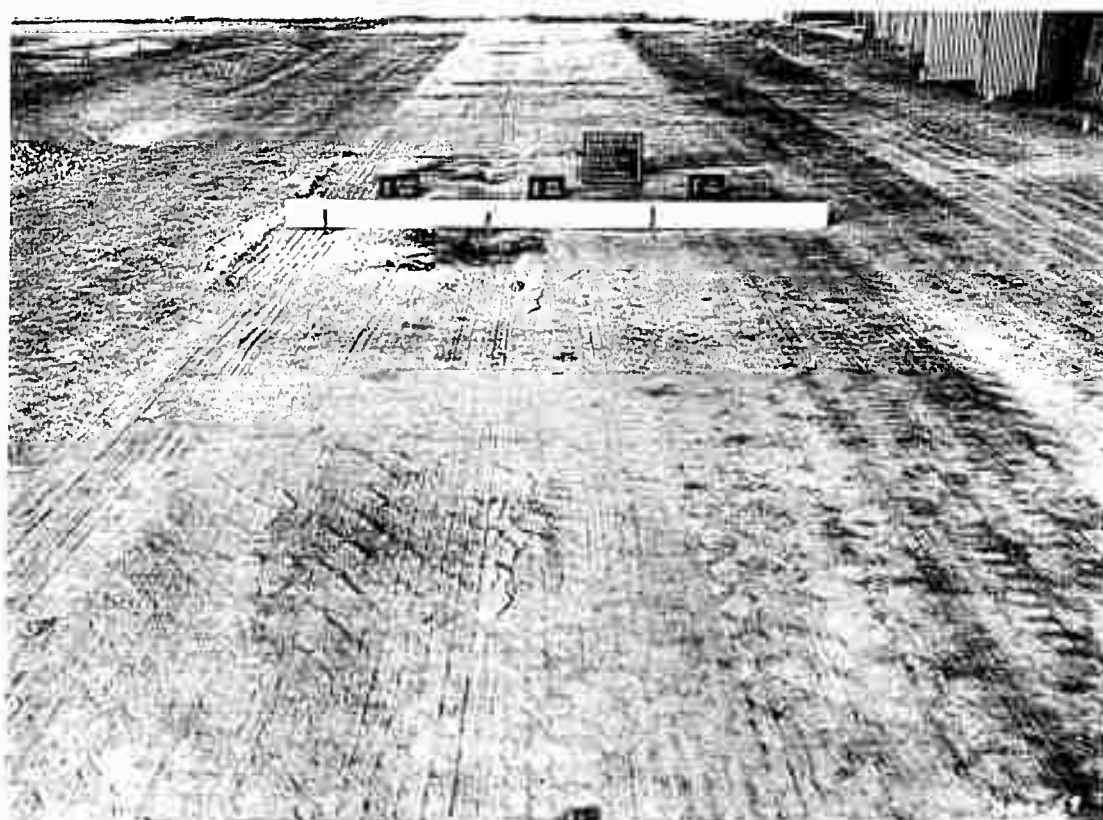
Progressive failure at sta 4+77, lanes B and C, section II, after 10 applications of traffic
